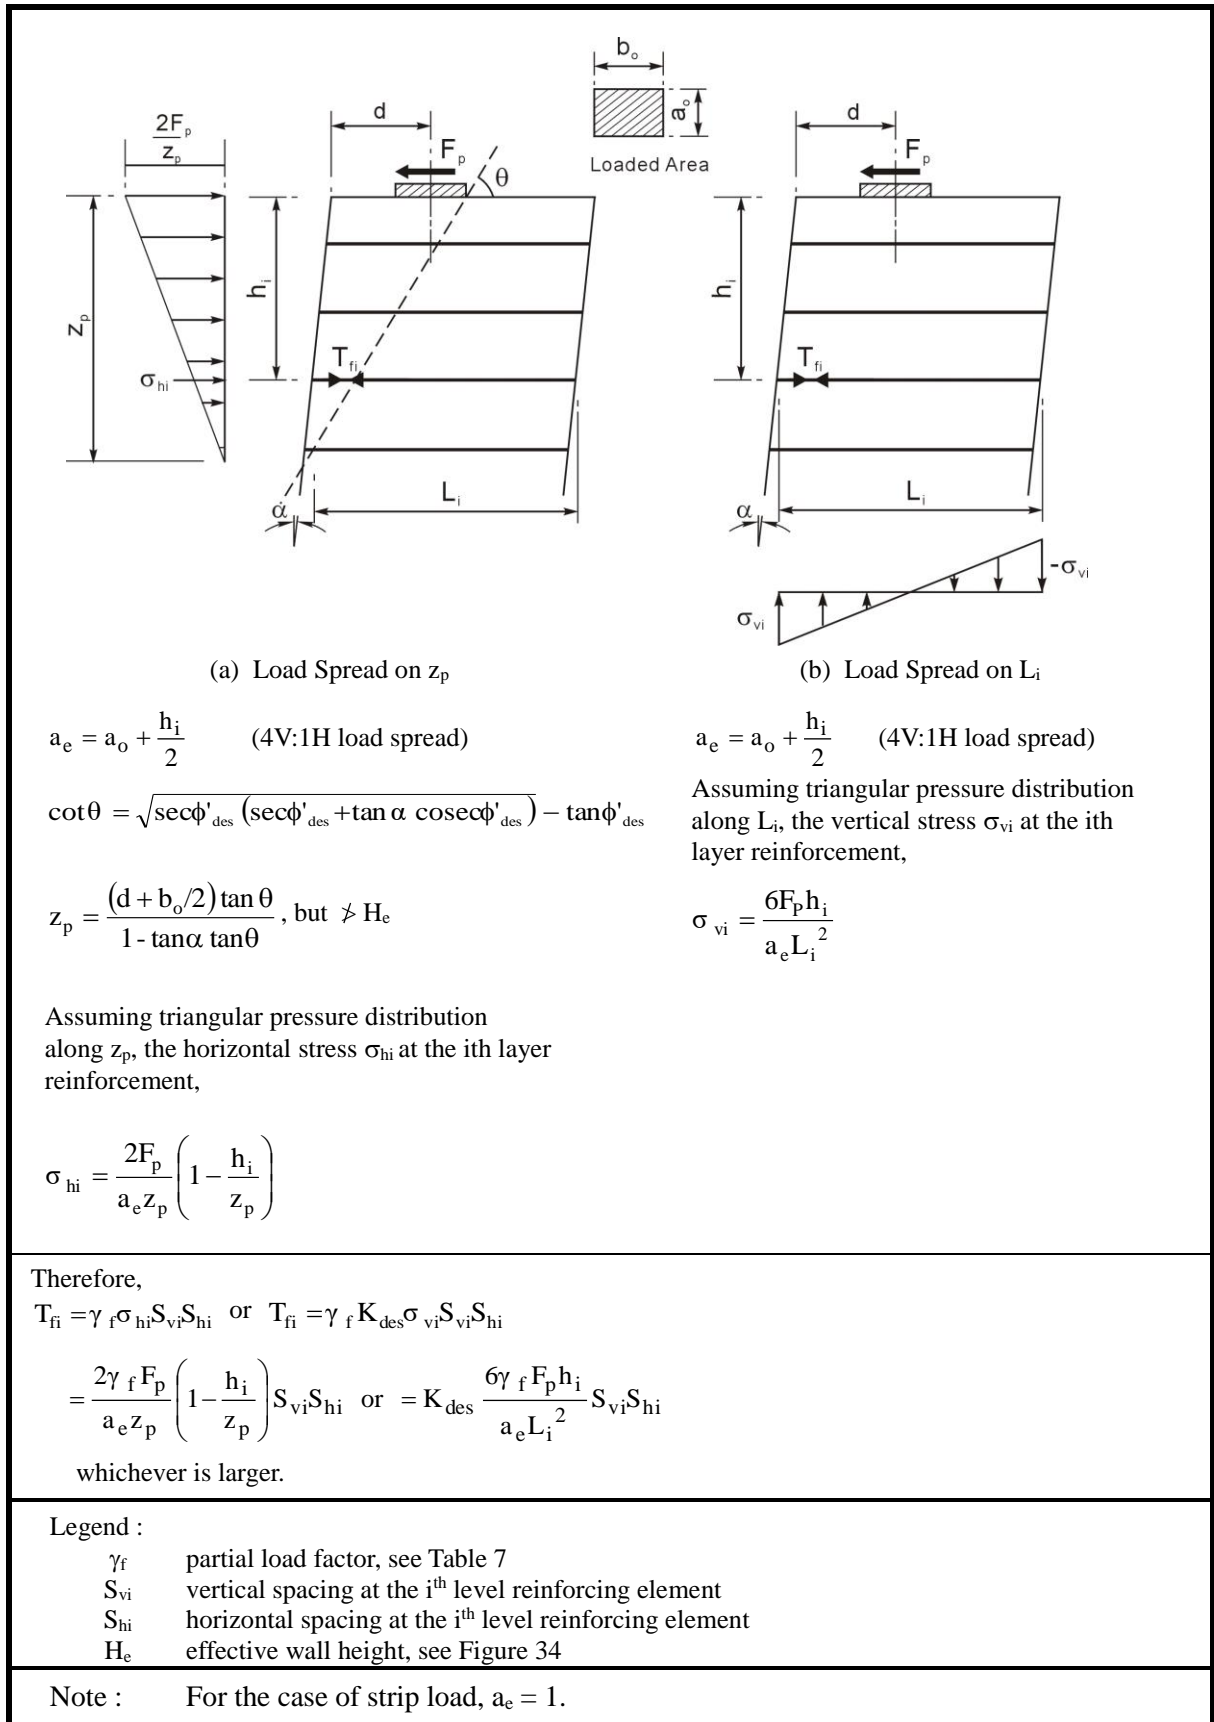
Tensile Force due to Horizontal Load F_p on Top of the Structure
